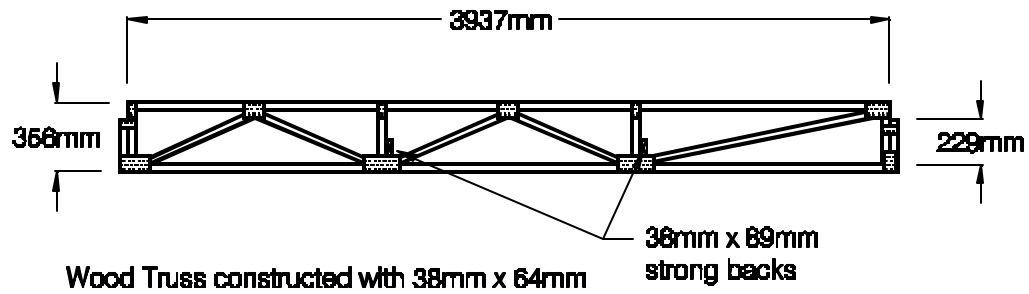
Construction of 356 mm deep wood trusses using 38 x 64 mm lumber
